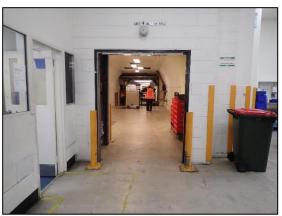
View east of tunnel beneath YHA leading to Central Station.
